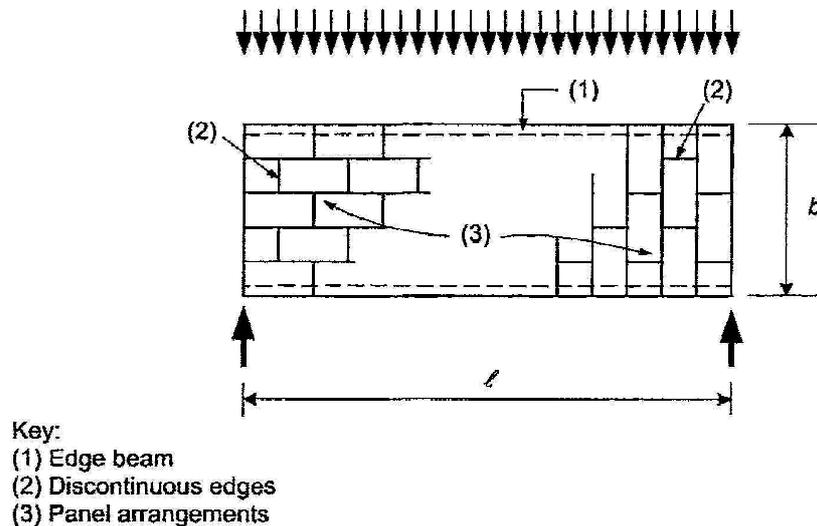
Diaphragm loading and staggered panel arrangements (Source: Eurocode 5 prEN 1995-1-1:2003)
